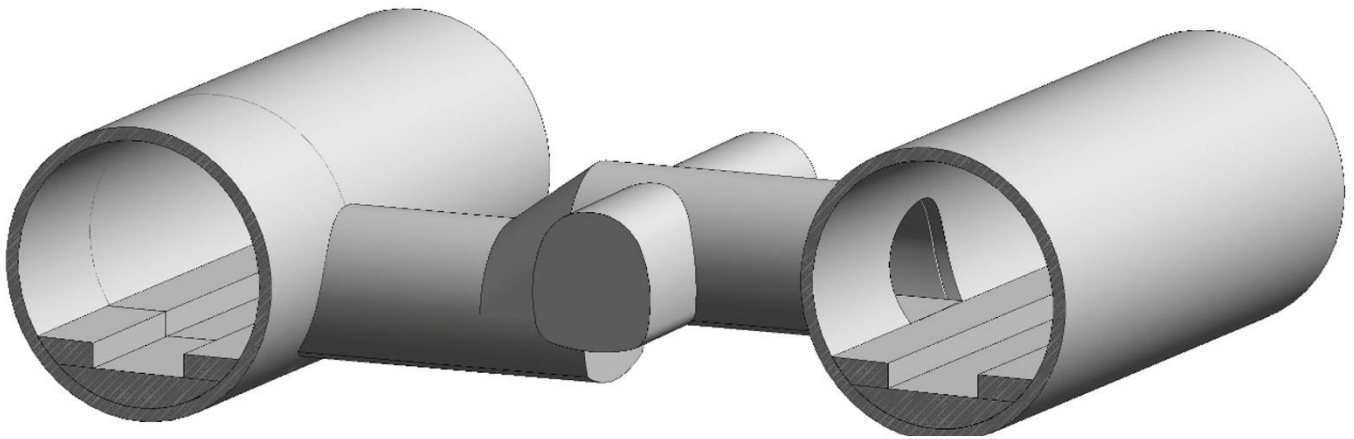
Střížkovský tunnel connection with cross-cut and different elevations of track tunnels
